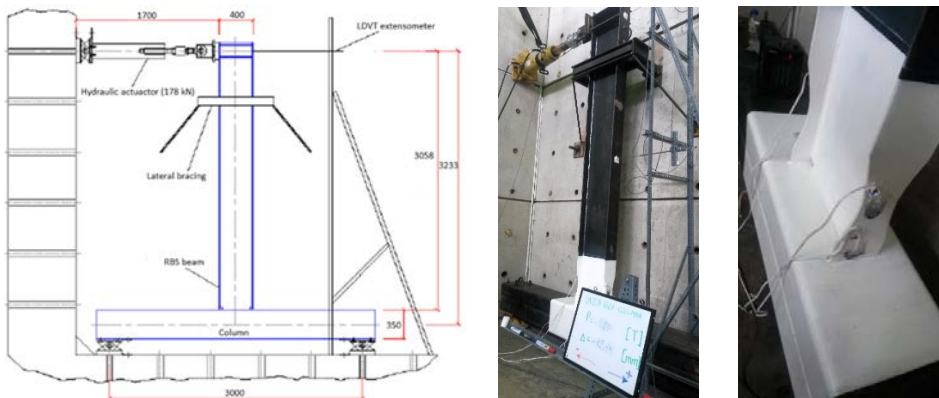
Test scheme, final assembly and extensometers on the beam flanges.
